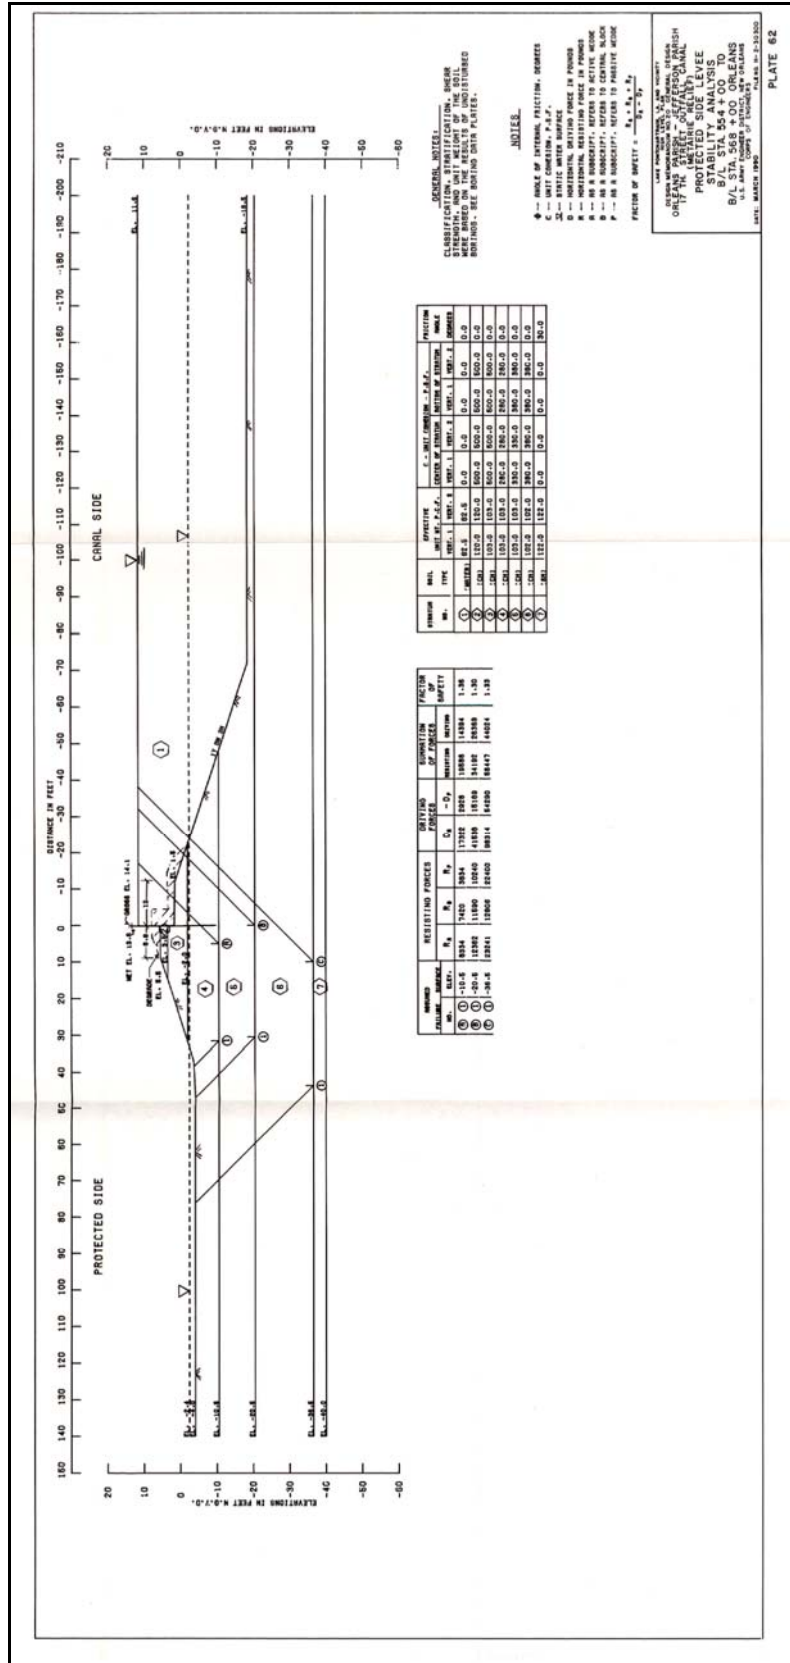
Design cross section, from GDM 20, Plate 62.
